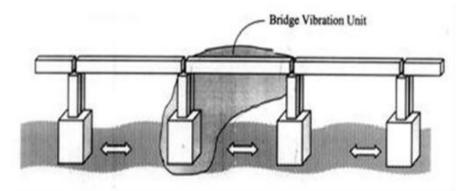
Vibration unit of pier bridge in Longitudinal direction
